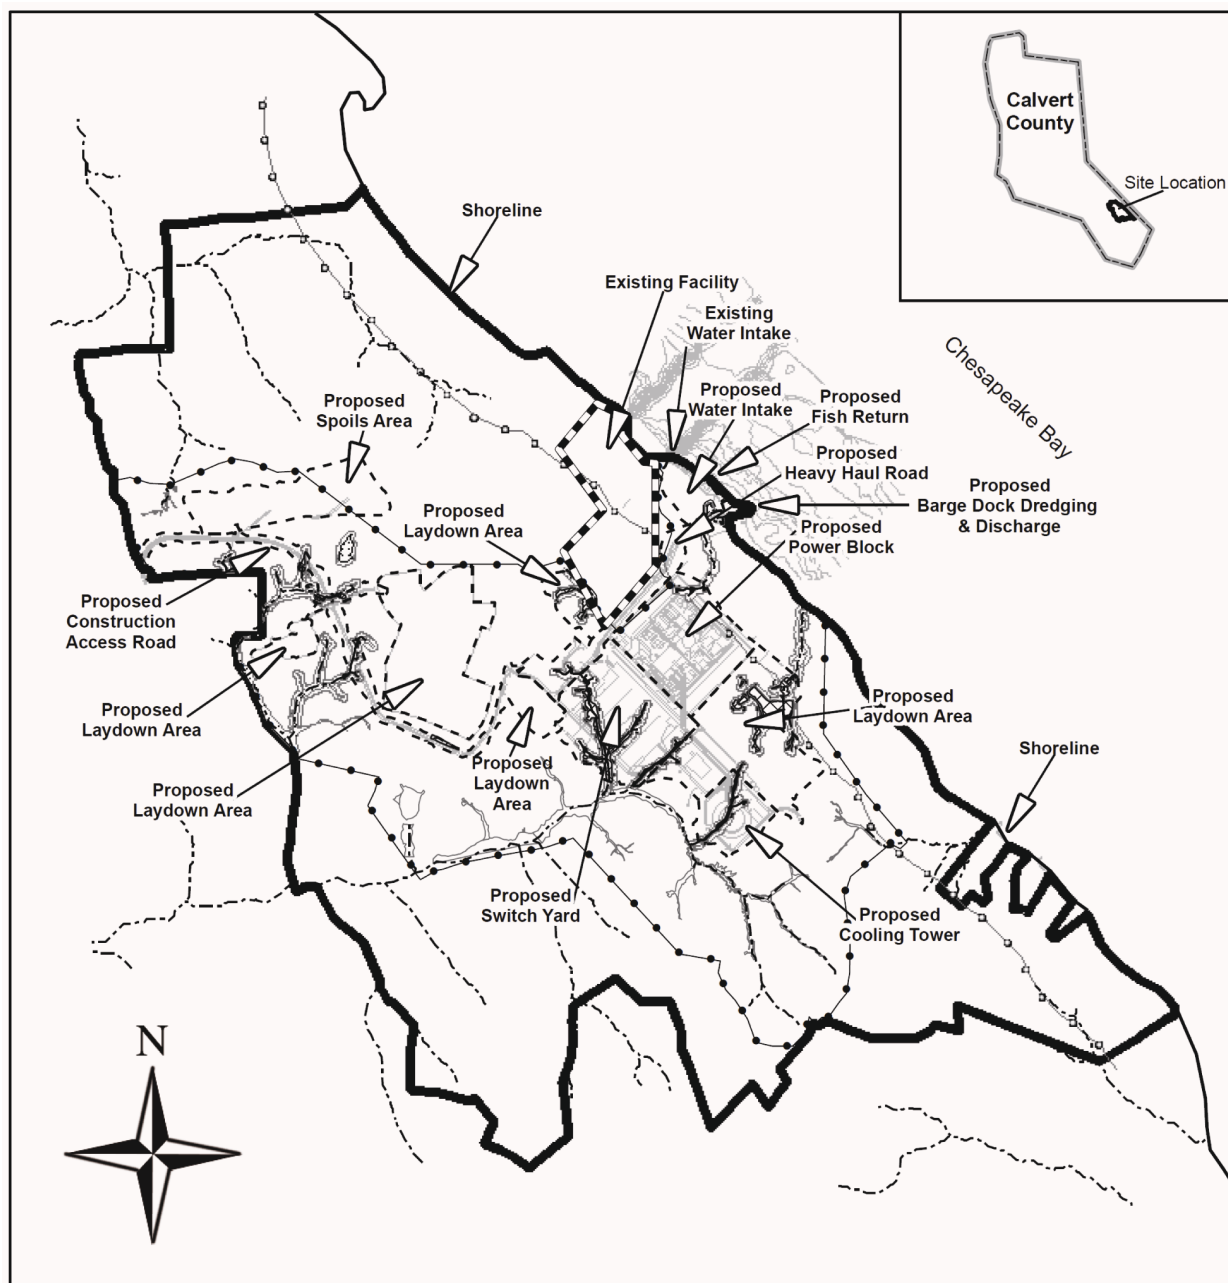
Calvert Cliffs Site and Layout of Proposed Unit 3 (UniStar 2008a)
